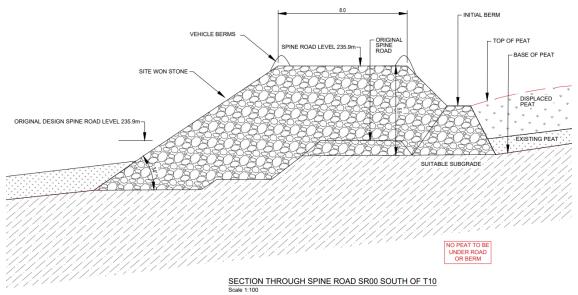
Spine Road south of T10 Peat Stabilisation Berm section
